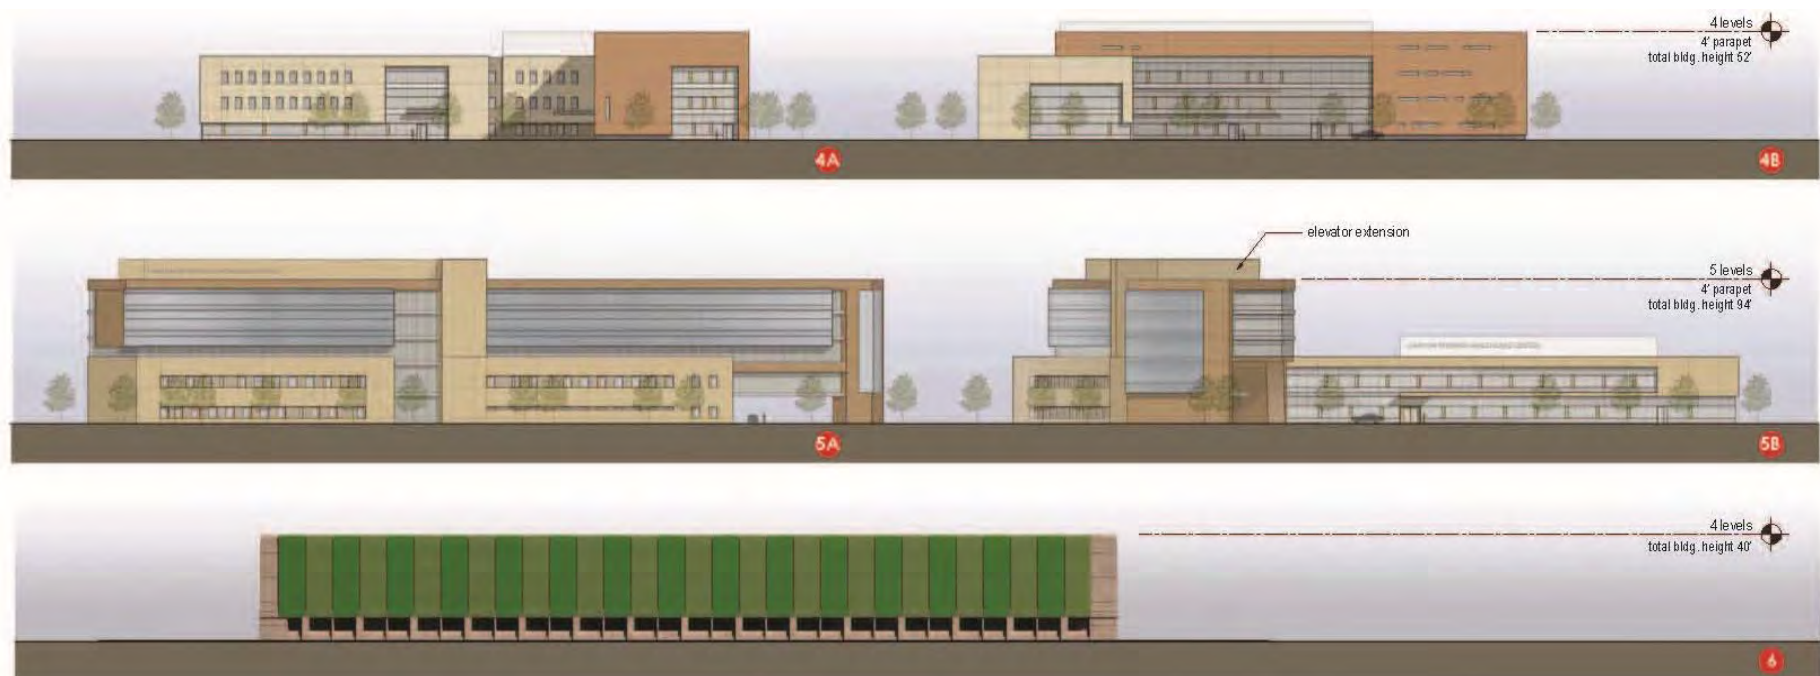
Project Plans (Conceptual Building Elevations)
